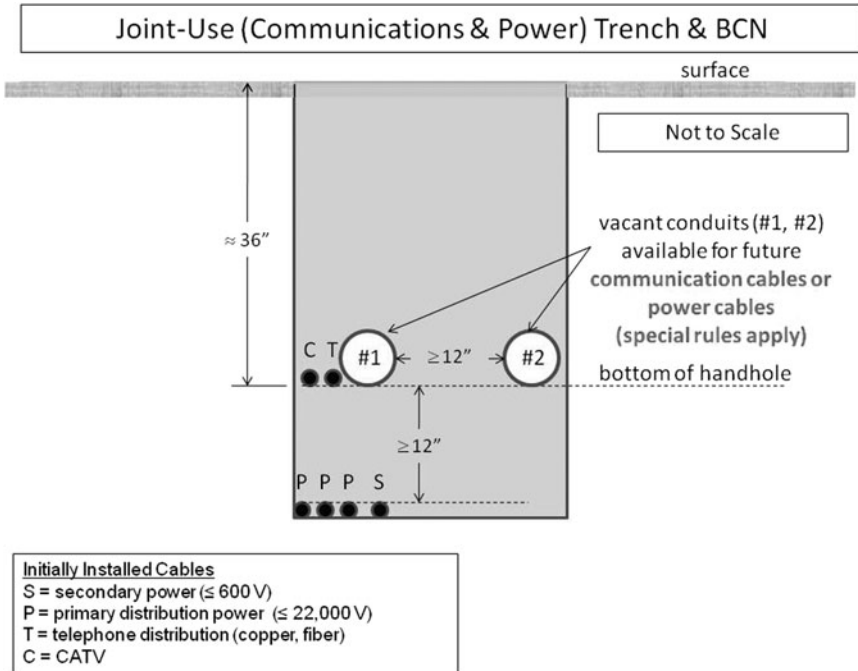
Joint-Use Trench, Including the Example BCN for Communication and Power Supply (Trench Backfill Details Not Shown; see Section 3.2.2.1).
